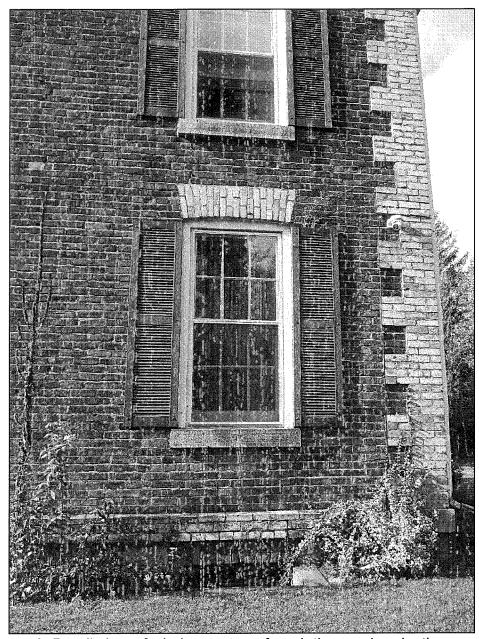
Detail view of windows, stone foundation, and projecting quoins
